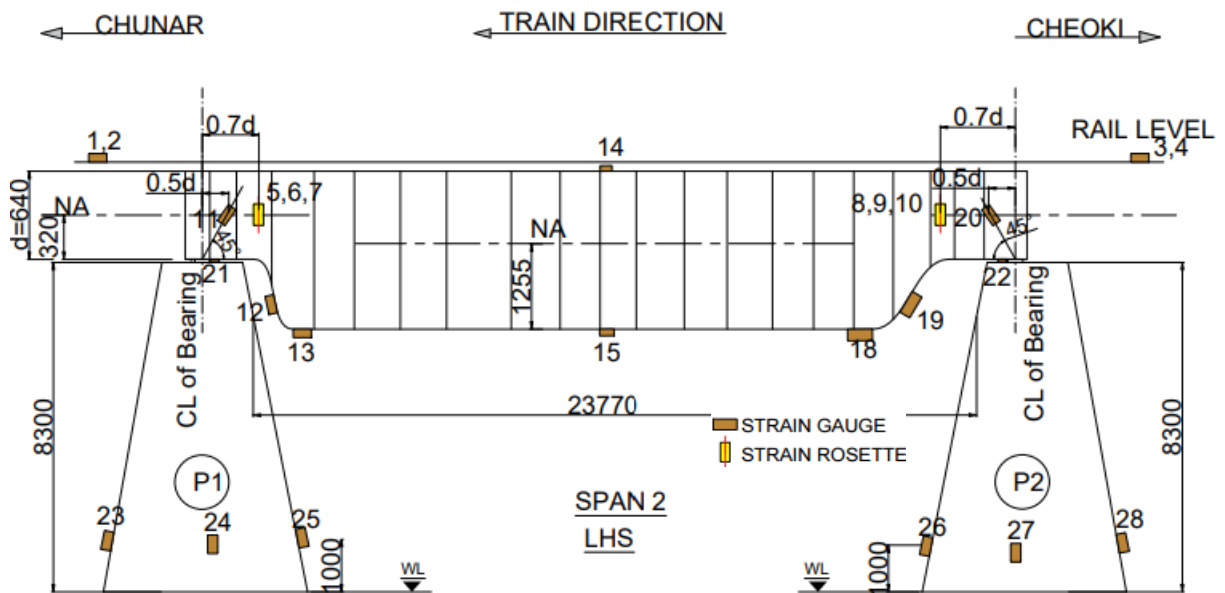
Strain gauge locations on the girder of span 2 (LHS)
